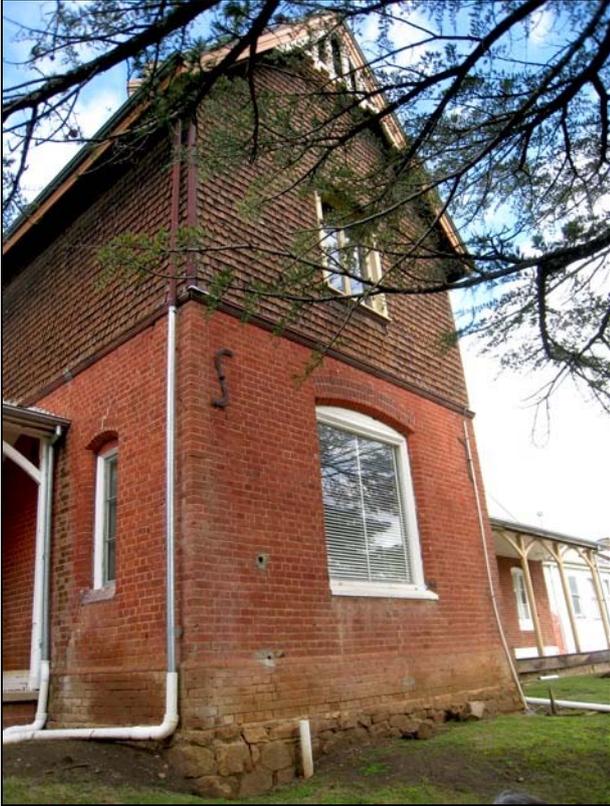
Carcoar Hospital Museum exterior, showing original wooden shingles, brickwork and foundations.
